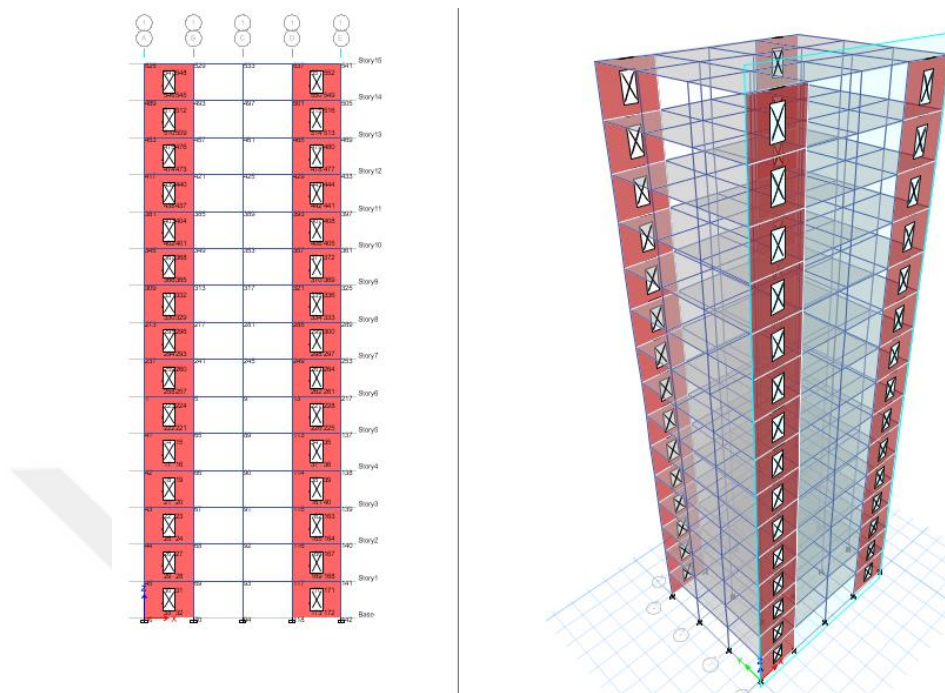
The 15-story building with concrete shear walls and with vertical openings.
